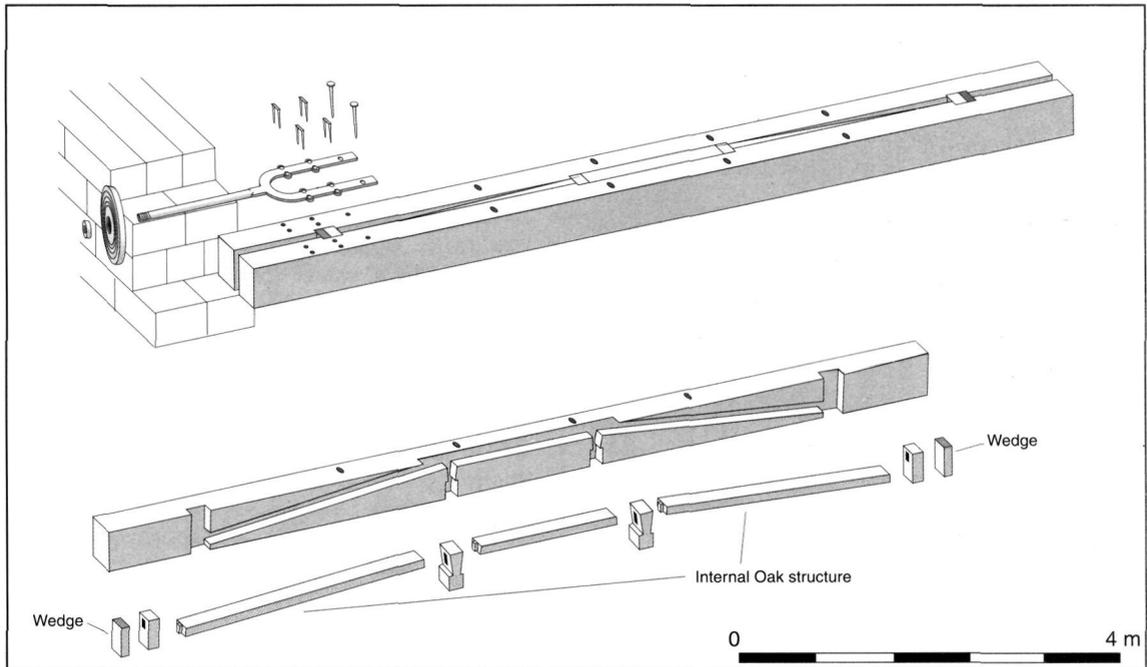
Composition of the trussed girders from the mezzanine floor (bolts omitted)
